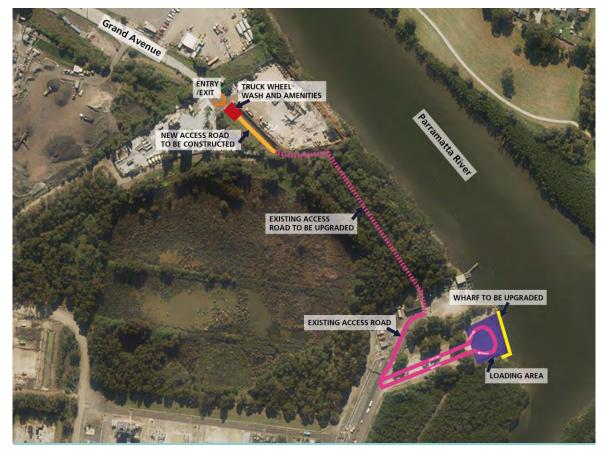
Plan showing the proposed layout for the Clyde Barging Facility Site (Transport for NSW).
